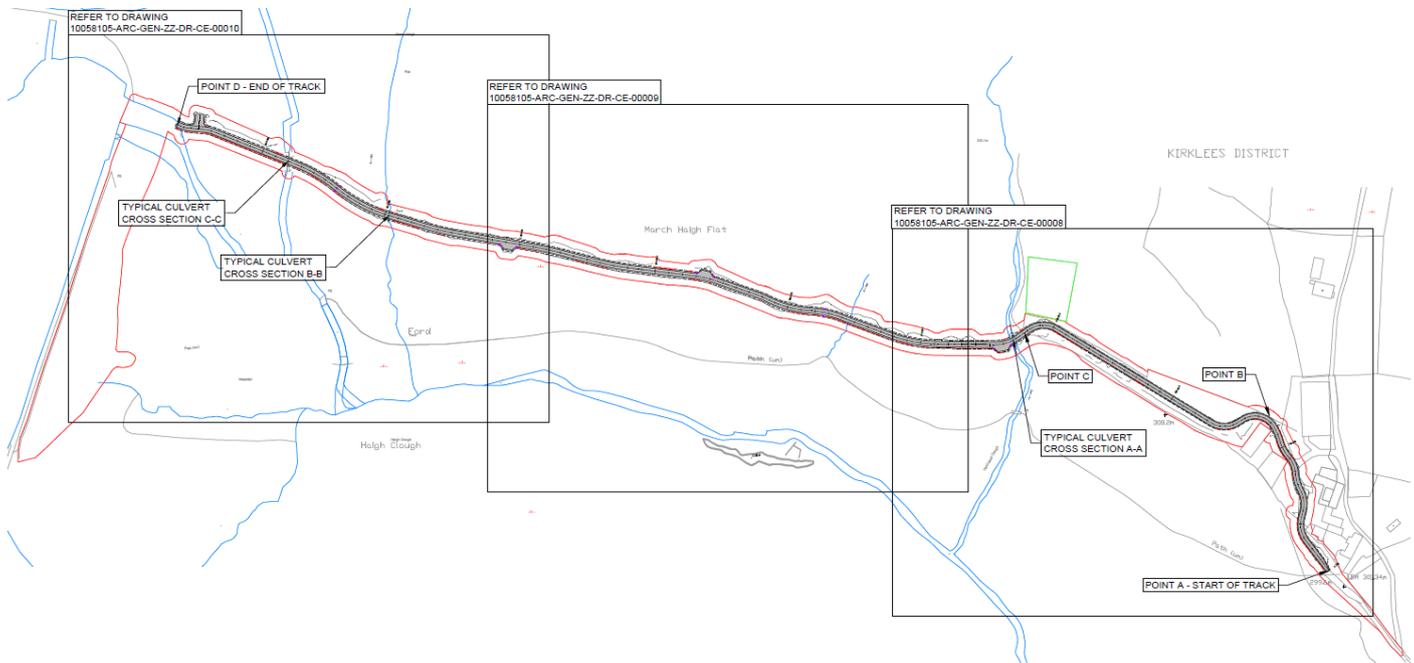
; Red line plan showing proposed access track to March Haigh Reservoir
